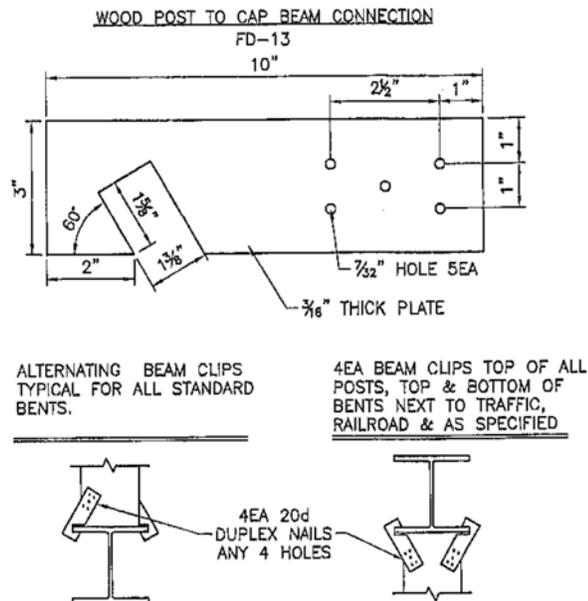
Wood Post to Cap Beam Connection Details (FD-13)
